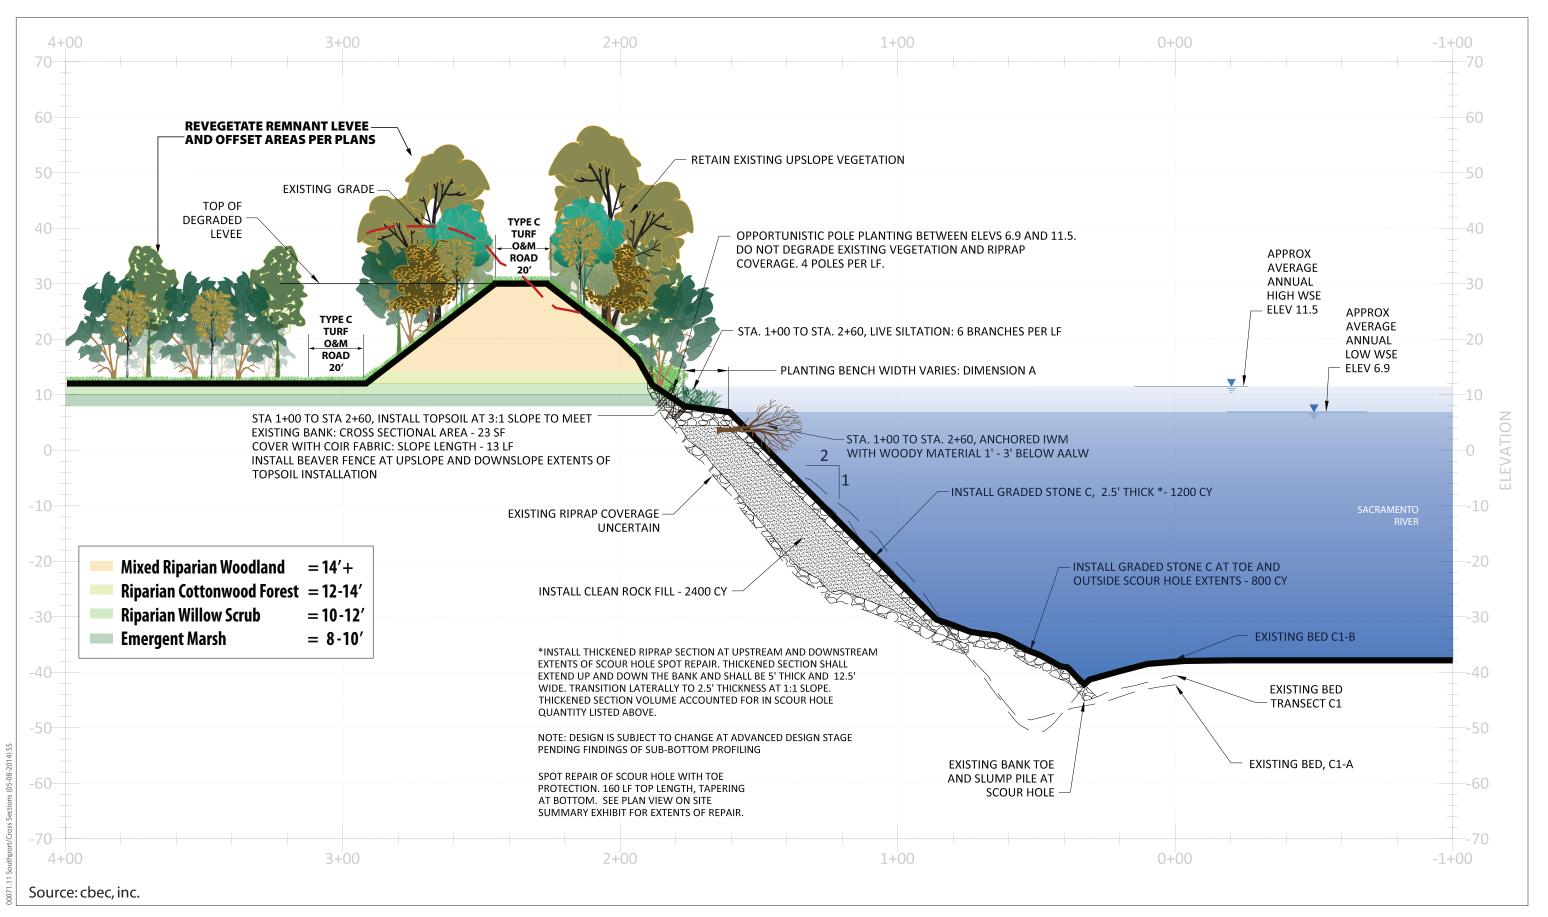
Typical Section of Bank Armoring, Fill, and Restoration Plantings Erosion Site C1, Remnant Levee, and O&M Roads Existing Levee Station 166+00
